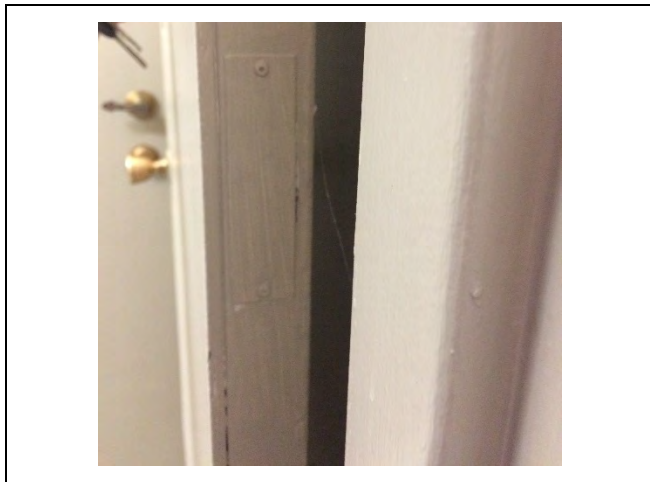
Presumed asbestos-containing fire rated door to the 1st floor stairwell.
